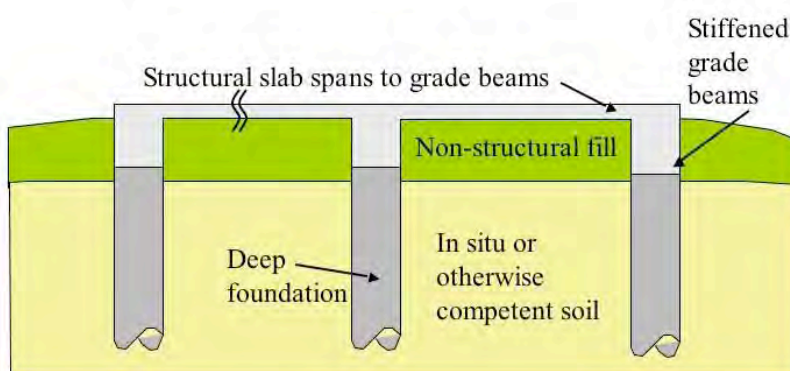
Stiffened Structural Slab with Deep Foundations
